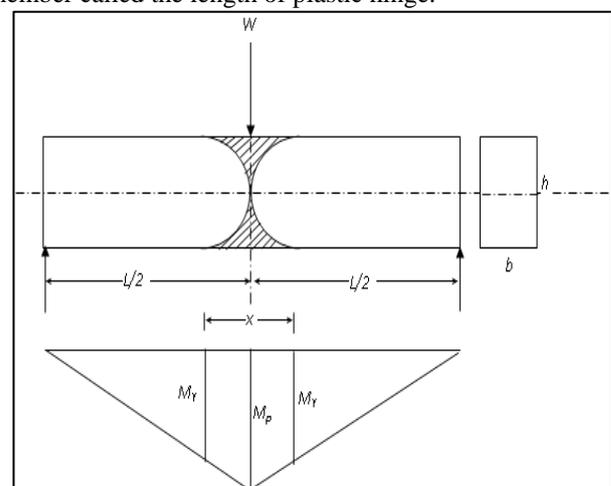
Hinged Length of a Simply Supported Beam with Central Concentrated Load
